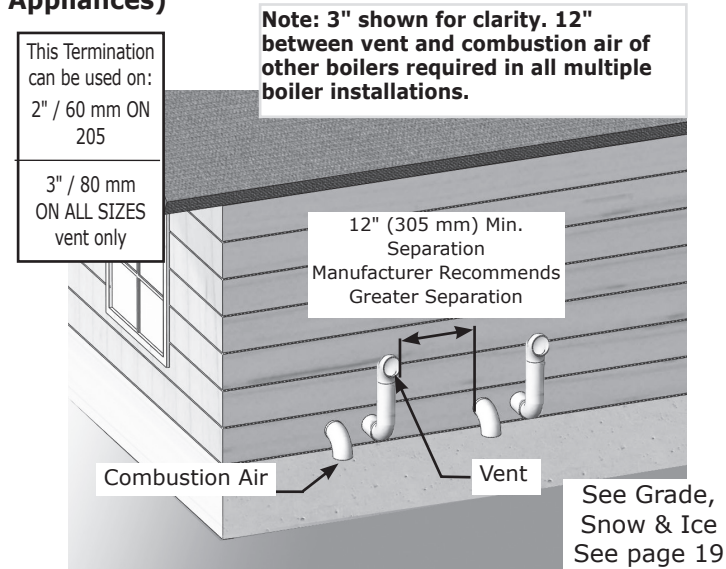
(3" / 80 mm ONLY) Twin Pipe Side Wall with 45° Vent
